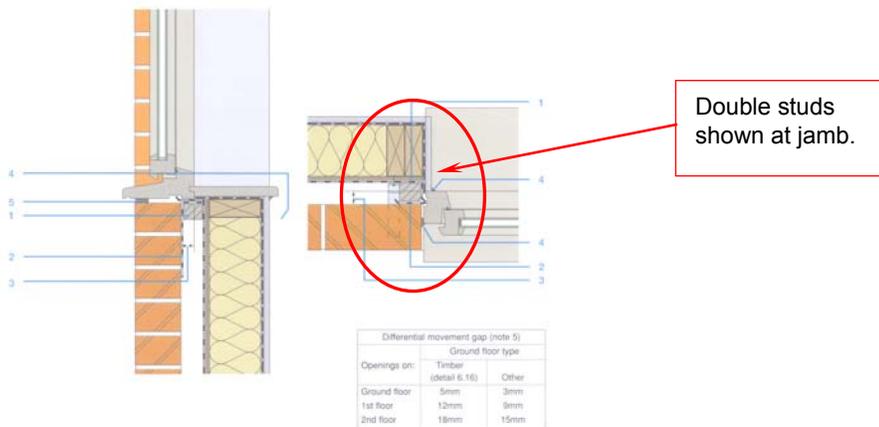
Robust Detail 6.10; Jamb and sill details in timber frame construction.
